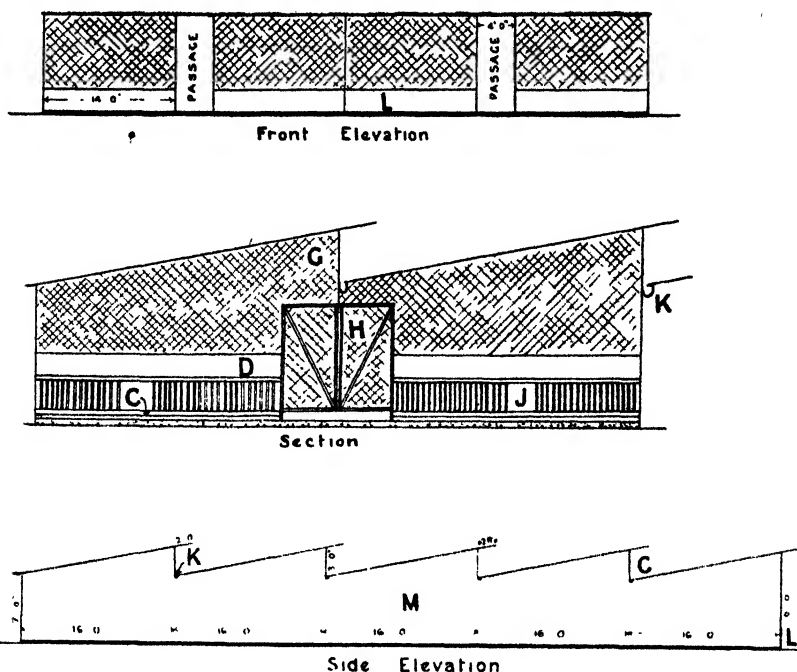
Intensive shed, front and side elevation and section. (C) Water and feed troughs. (D) Nest boxes 24 inches above floor level. (G and H) Wirenetting. (J) Wooden slats above a 6 inch board. (K) Gutter. (L) Corrugated iron sheet on edge. (M) Sides of shed totally enclosed.
